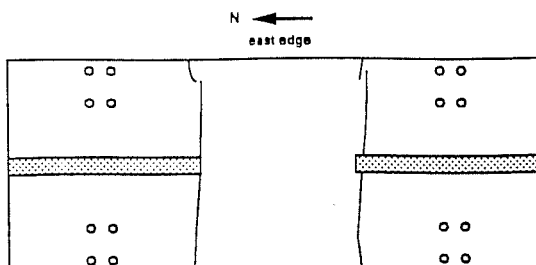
Sp. 2b: Progression of Cracking of Top Face of Second Floor Slab at Load Point 67
